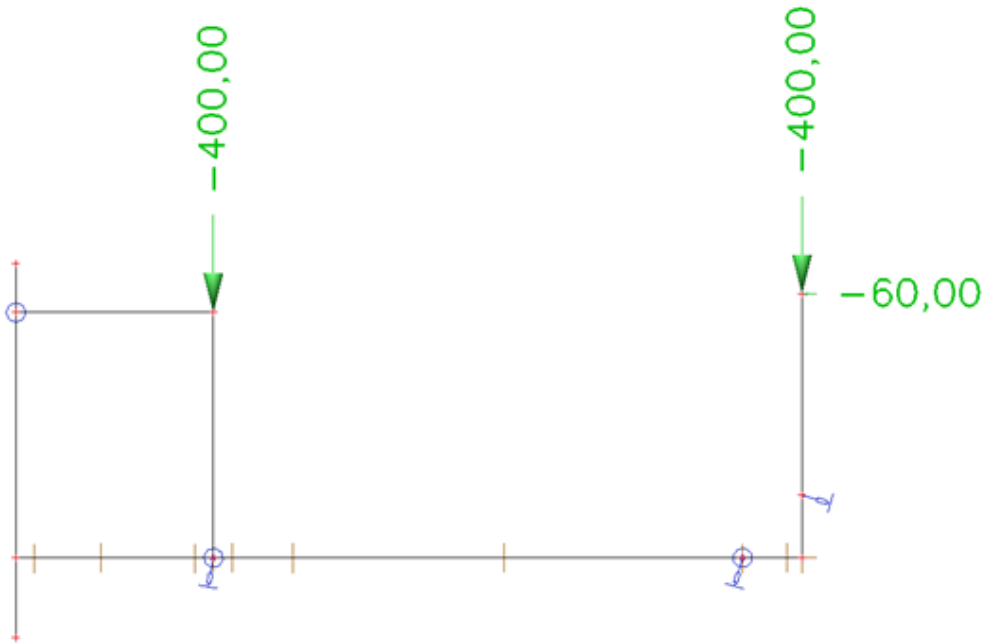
2D model: LC7-1- Crane load (ground side rail towards water)
